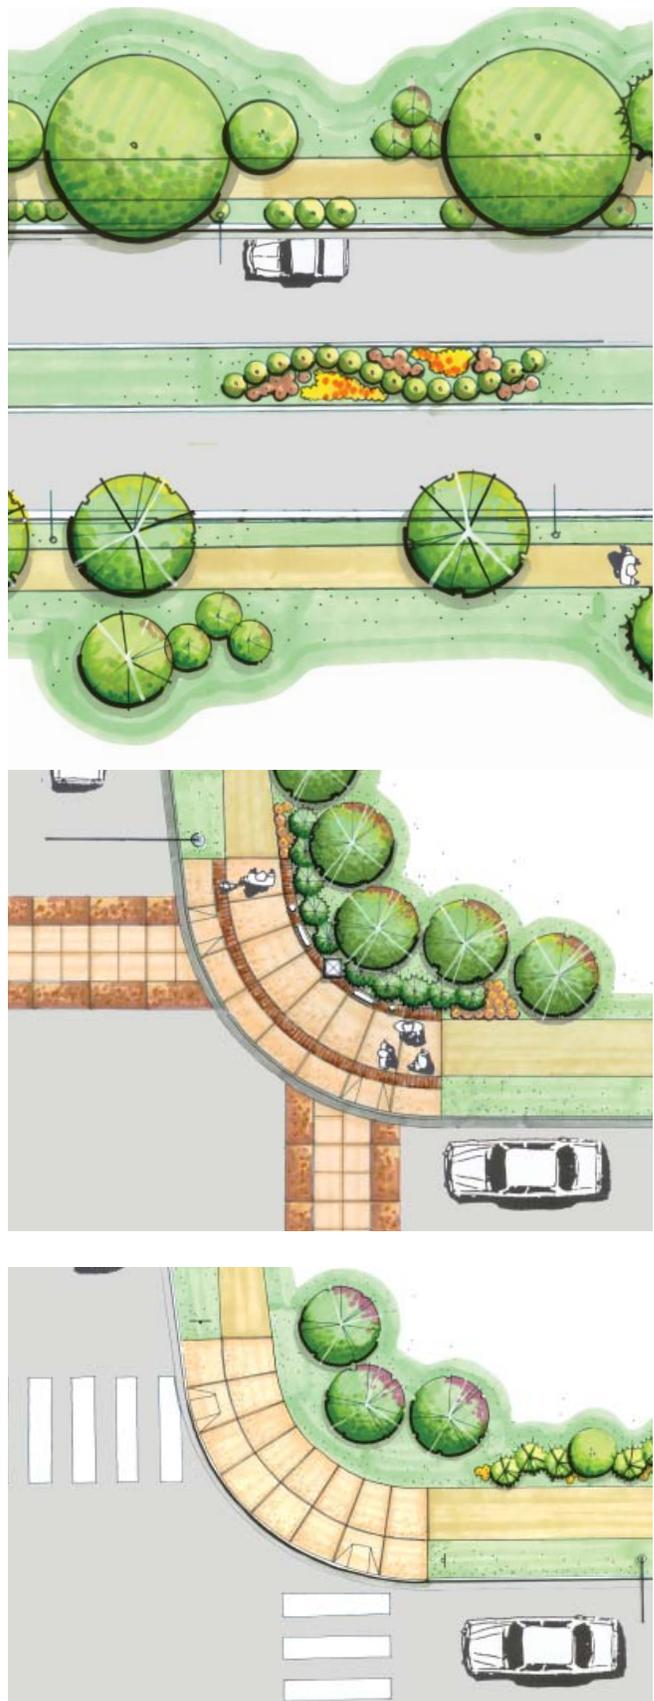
Typical plan views of multi-use trail and pedestrian nodes at primary and secondary intersections. Labeled drawings can be found in Section 2.
